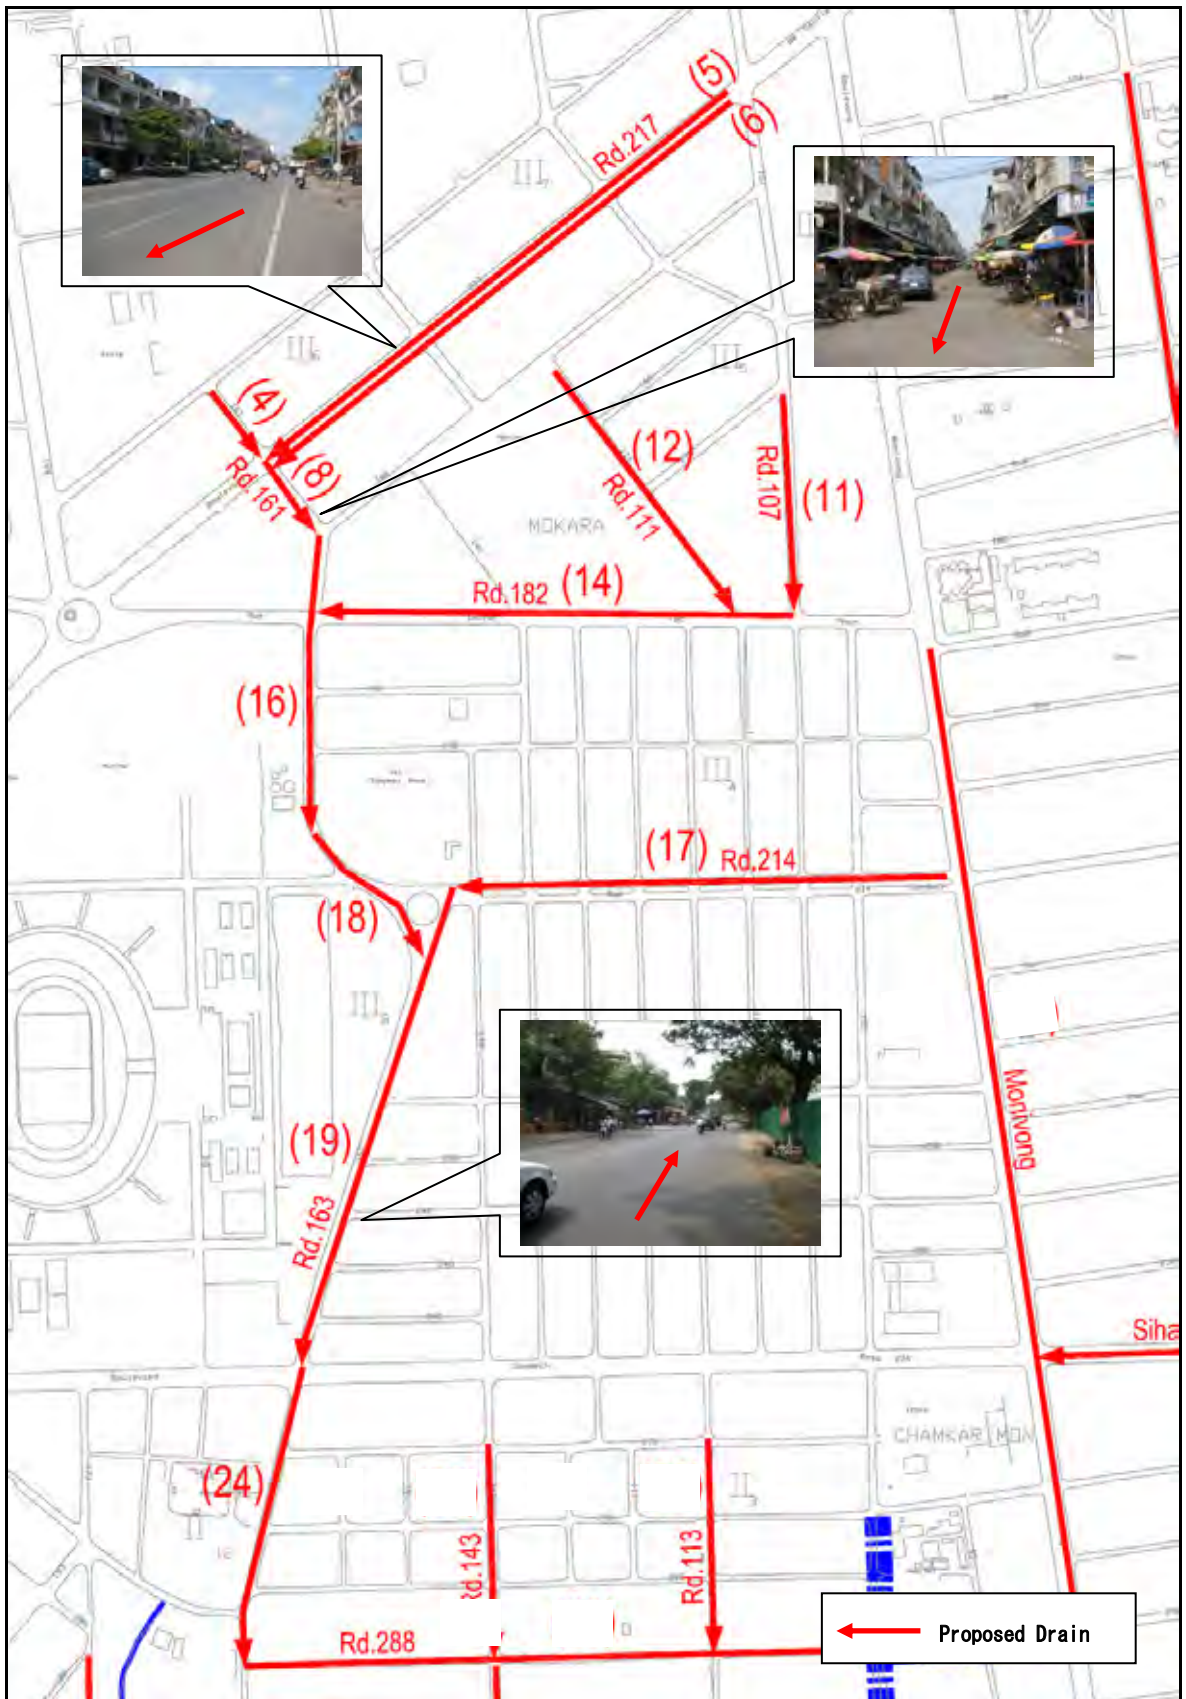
Alignment of Proposed Drainage Pipes (Ou Russei Area)
